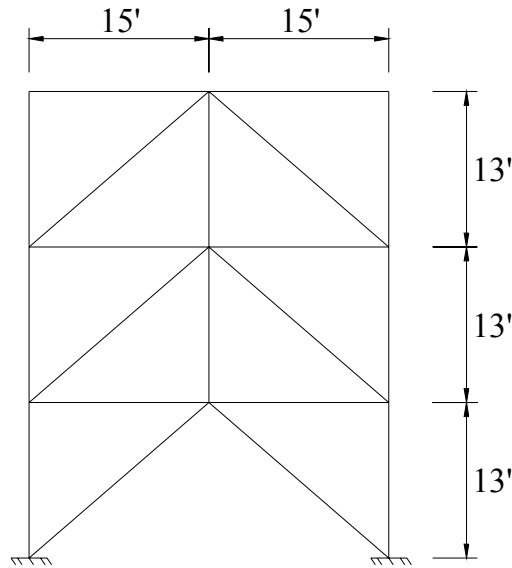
Elevation of one zipper-braced bay to be designed.
